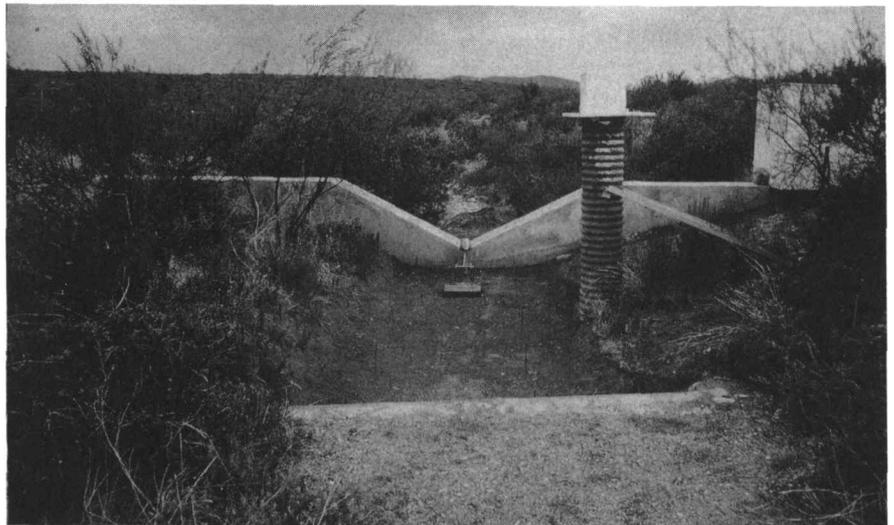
Sediment trap above Walnut Gulch runoff-measuring station 104 (looking downstream).
